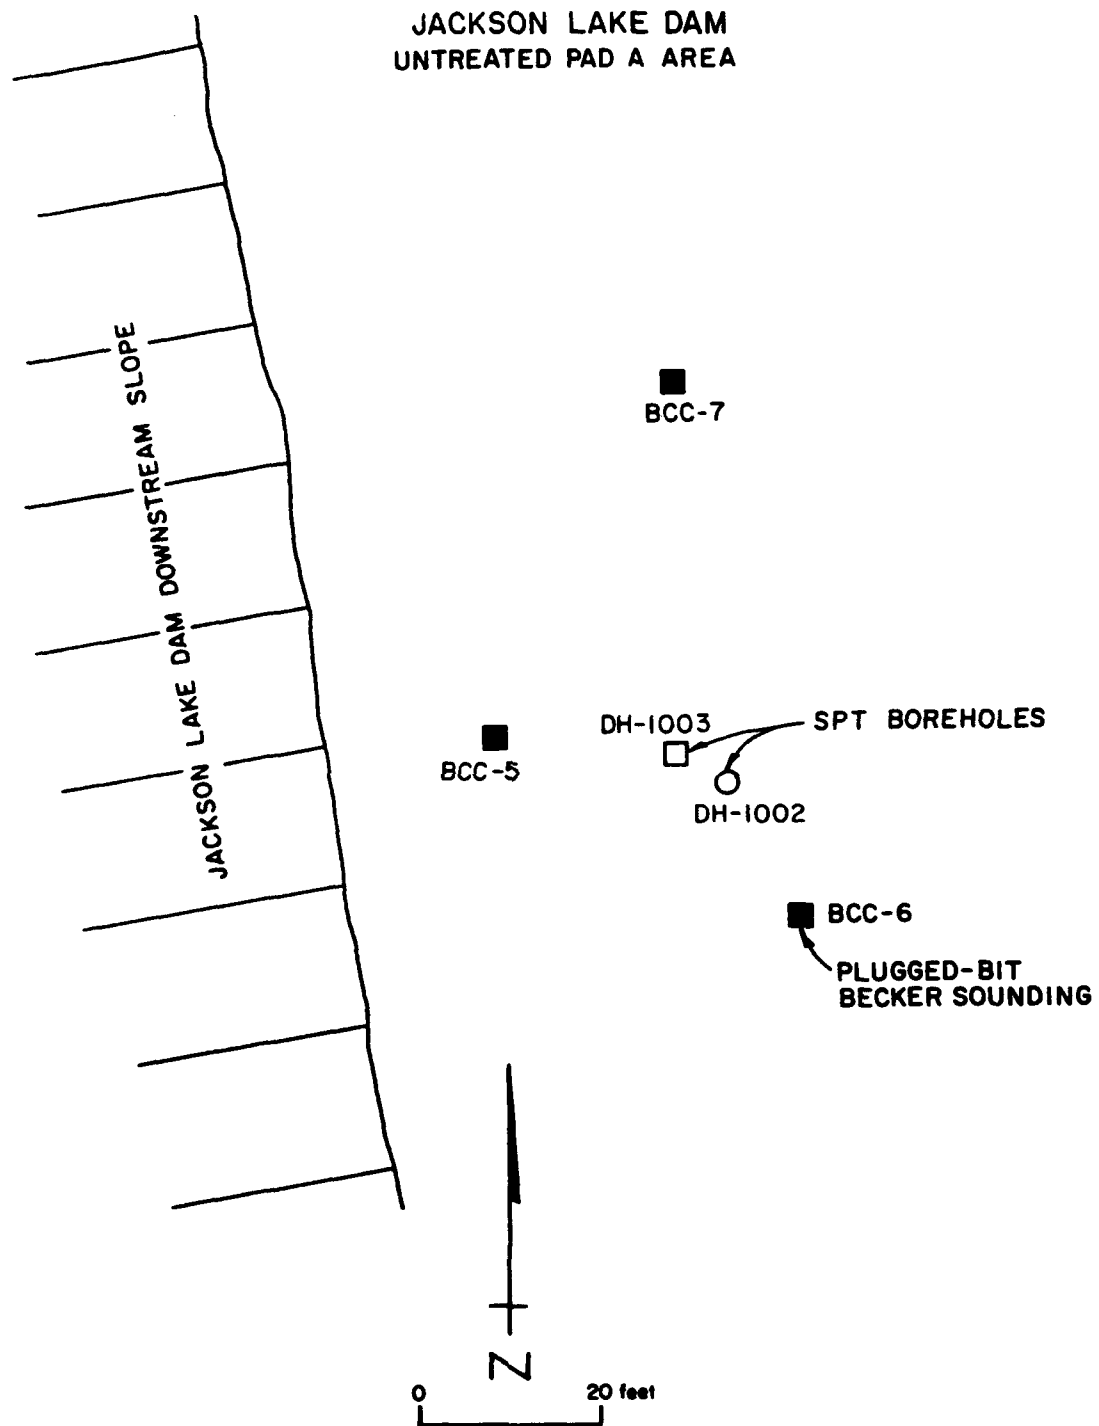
Plan View of Pad A Test Site at Jackson Lake Dam
